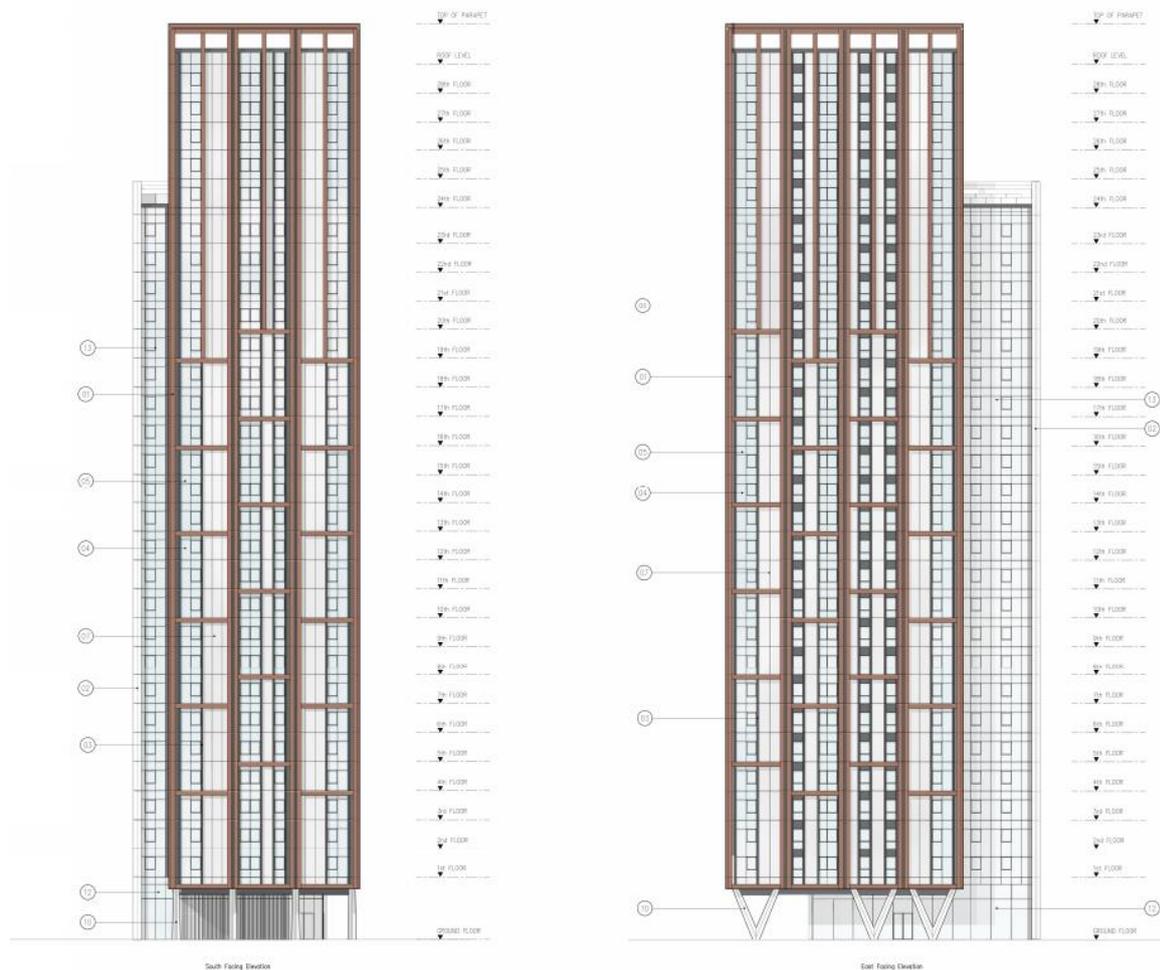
Block B elevations of 'taller component' (south and east facing elevations respectively)
